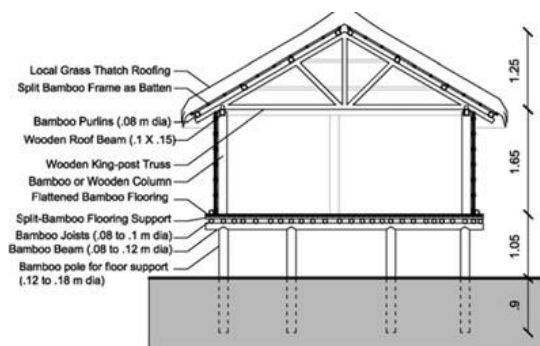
Measure drawing of a typical Bamboo House on Stilts
